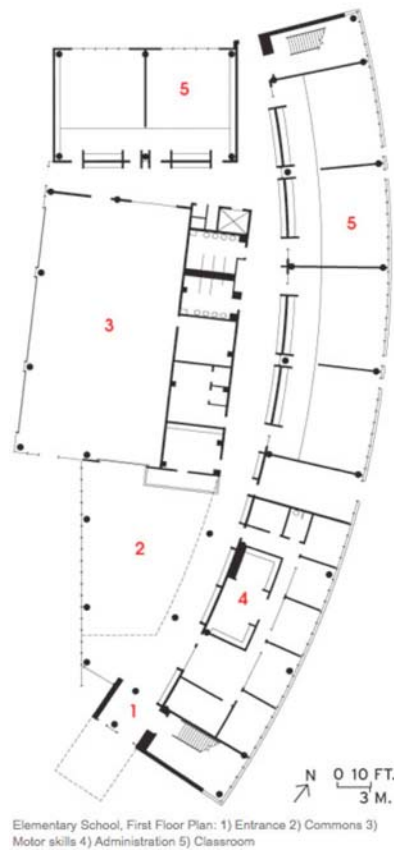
First floor plan. Adapted from “Making Connections: Despite Space and Budget Constraints, Concordia International School Shanghai Embraces a Community Feeling” by J. Murdock, n.d., Retrieved from http://archrecord.construction.com/schools/08_Concordia_International.asp
